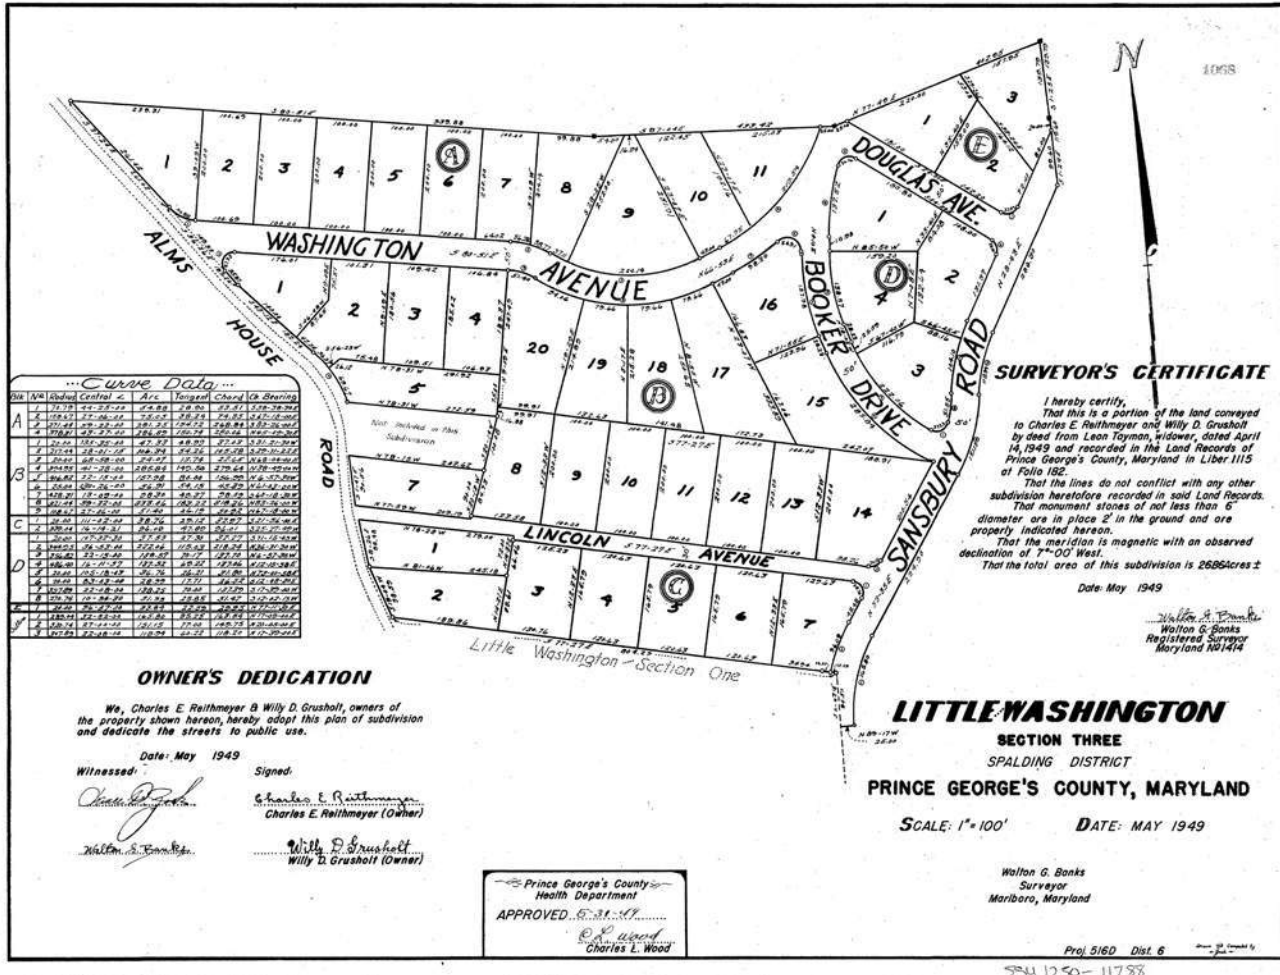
Little Washington Section 3 Plat (PGCDB WWW16:43, 1949)
